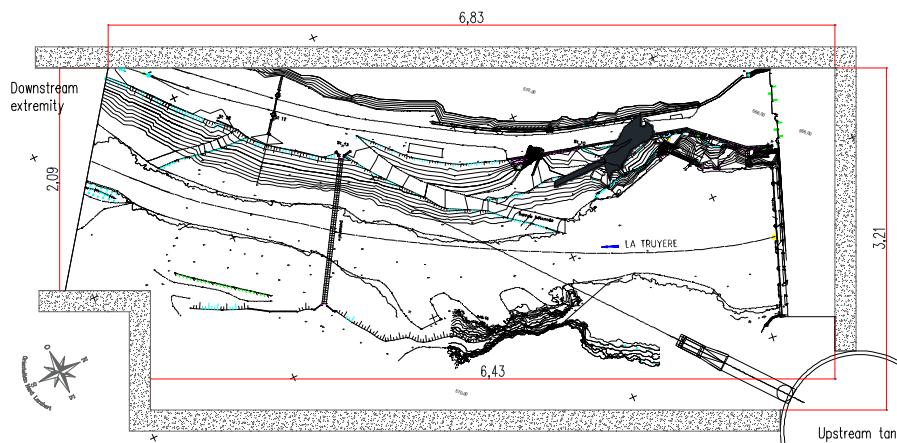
Plan view of the 1:35 scale model. Dimensions in m.
